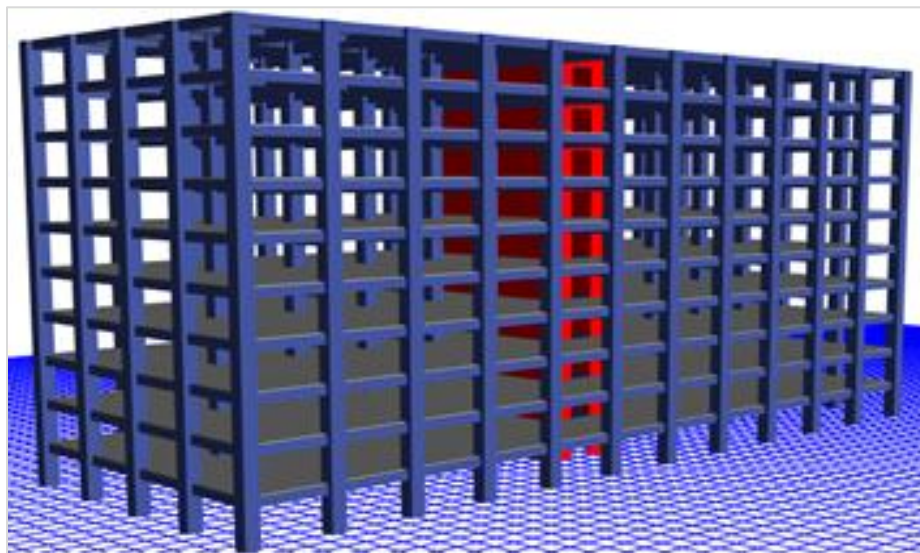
3D View of structural skeleton of framed tube structure with core shear wall
